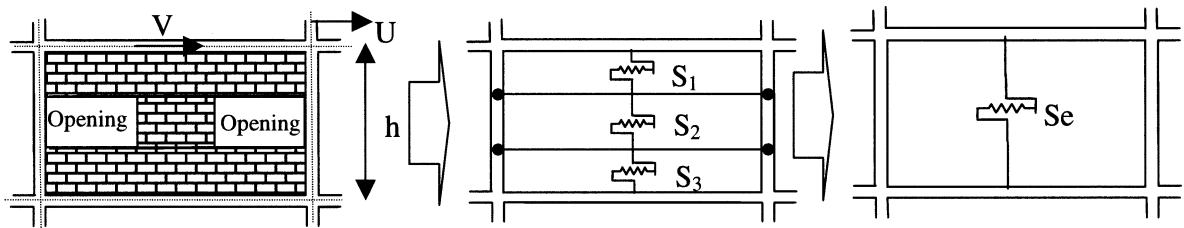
d. Infill masonry walls with two mid windows opening Type E.
